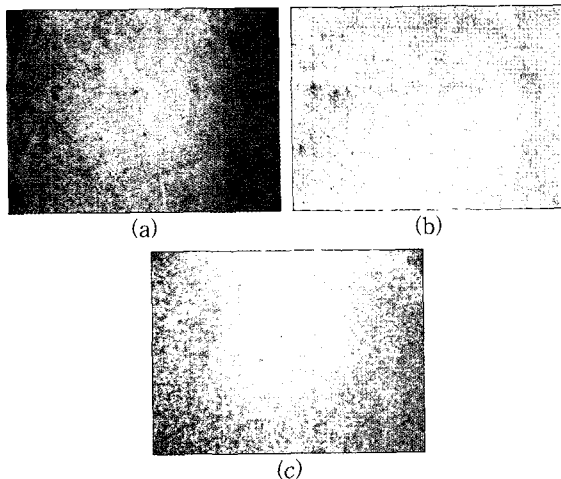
Photos of specimens((a)plain concrete, (b)color concrete(red mud 15%), (c)color concrete (pigment 5%).
